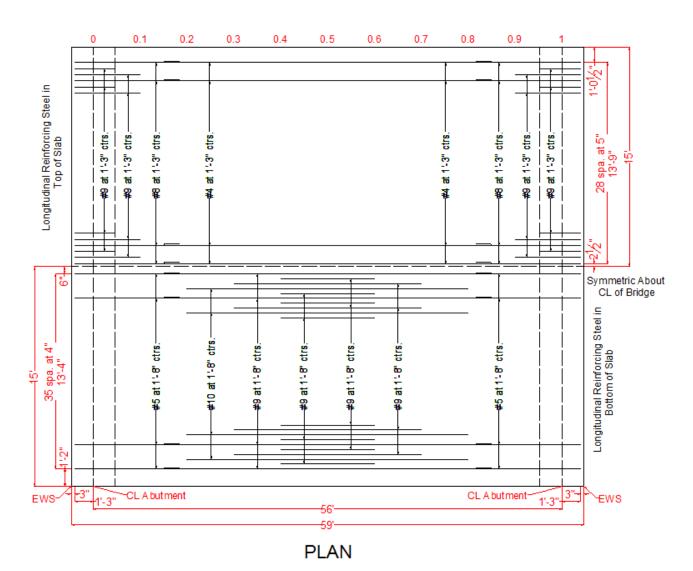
shows the reinforcement design for the 56-ft. haunched-slab section in plan view.
